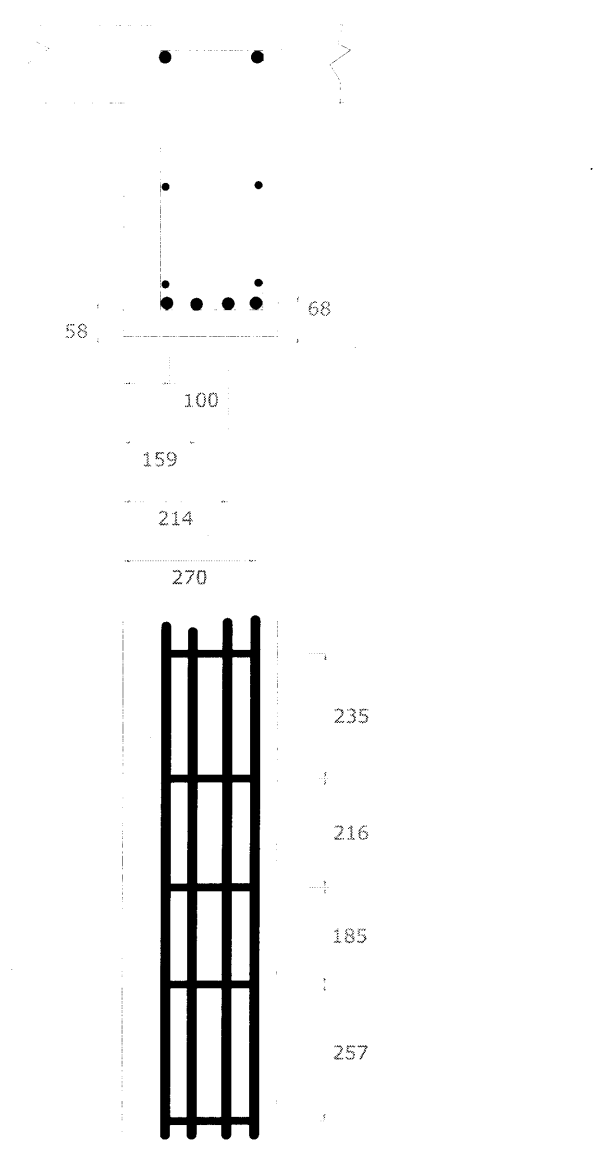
Detection of column reinforcement at ground floor of Accident Research Centre (ARC) building.
